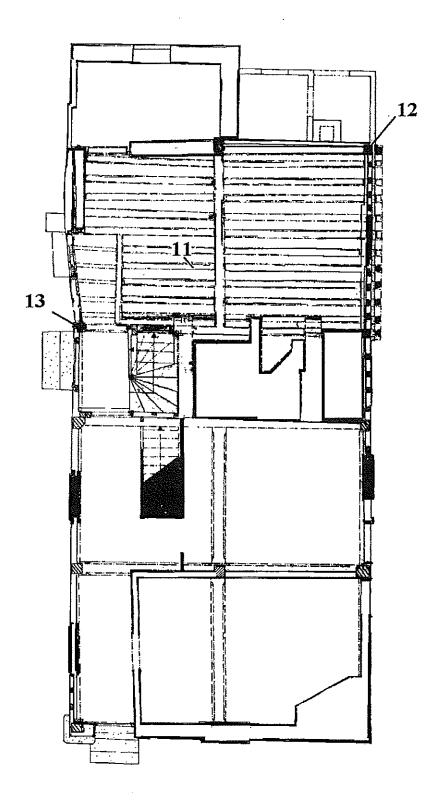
Plan of the ground floor of Brockley Hill Farmhouse, showing the locations of the timbers sampled for dendrochronology
